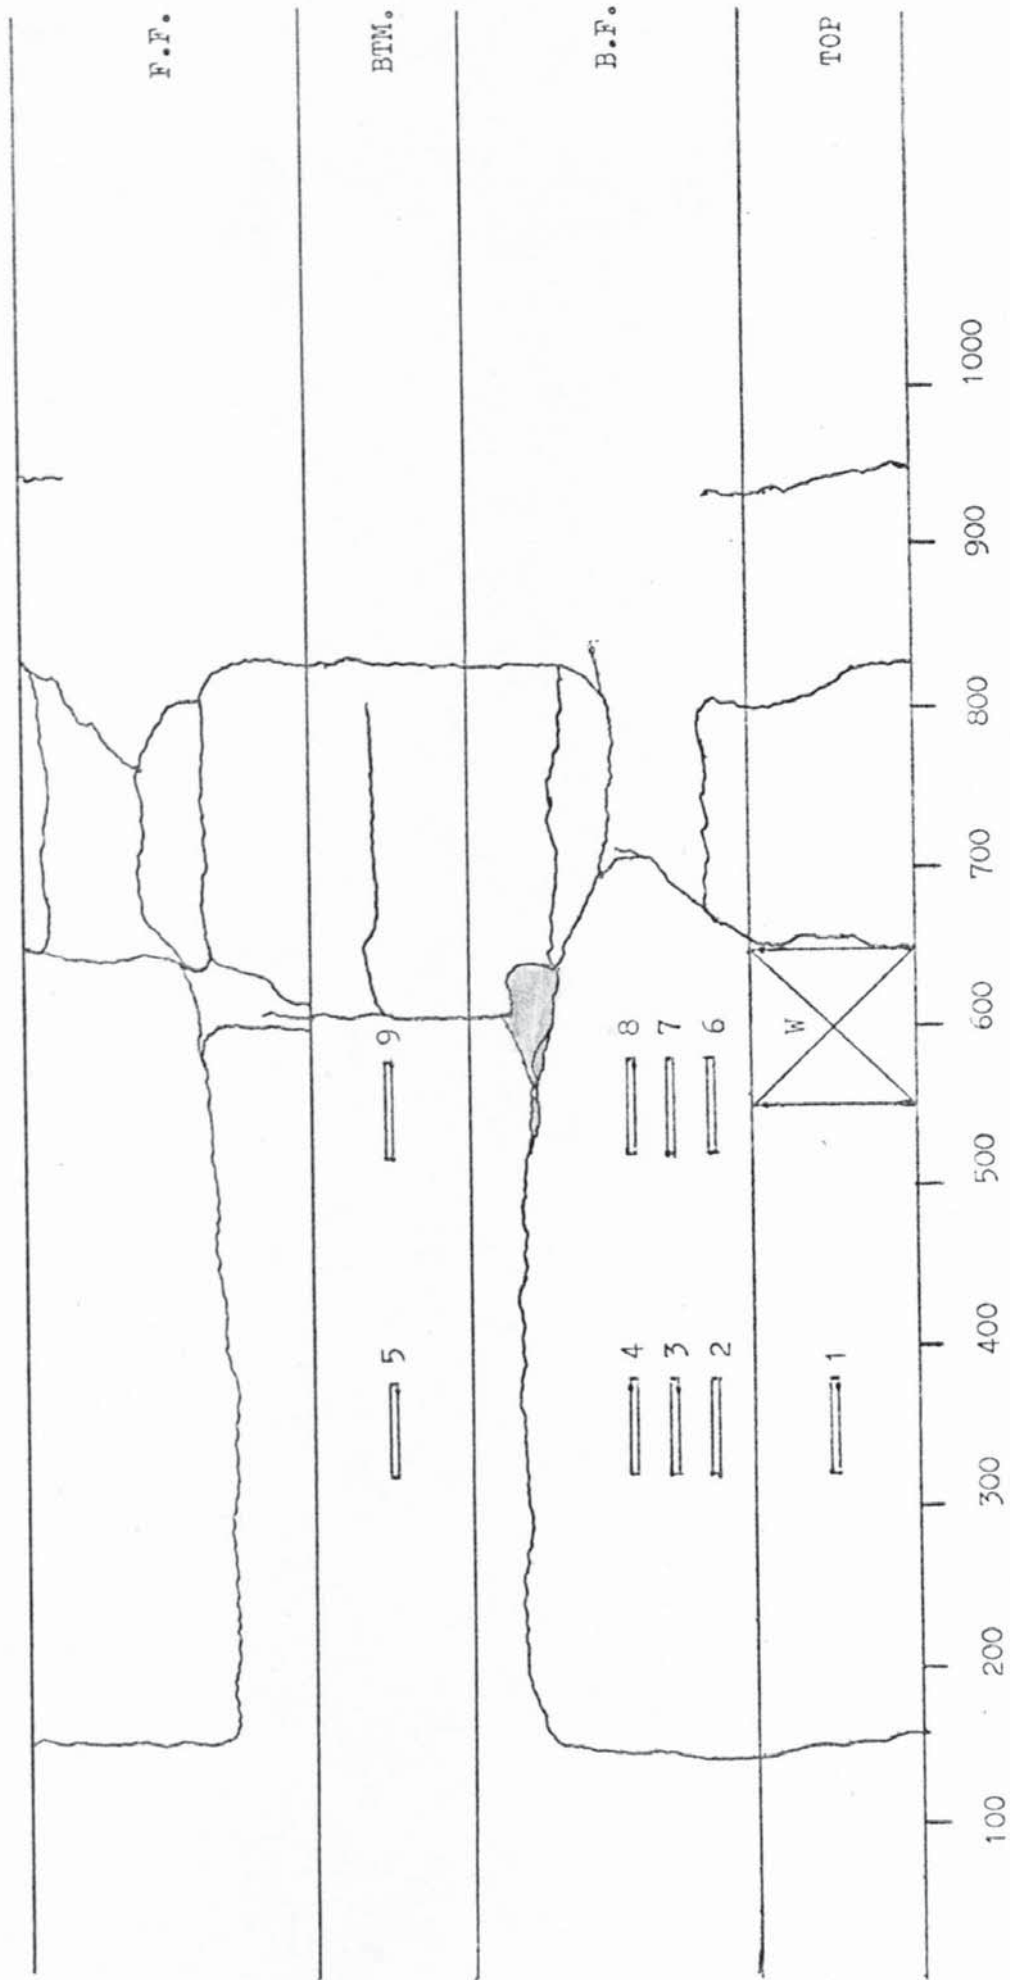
FAILURE CRACK PATTERNS - BEAM 3 (MODE 1.)
